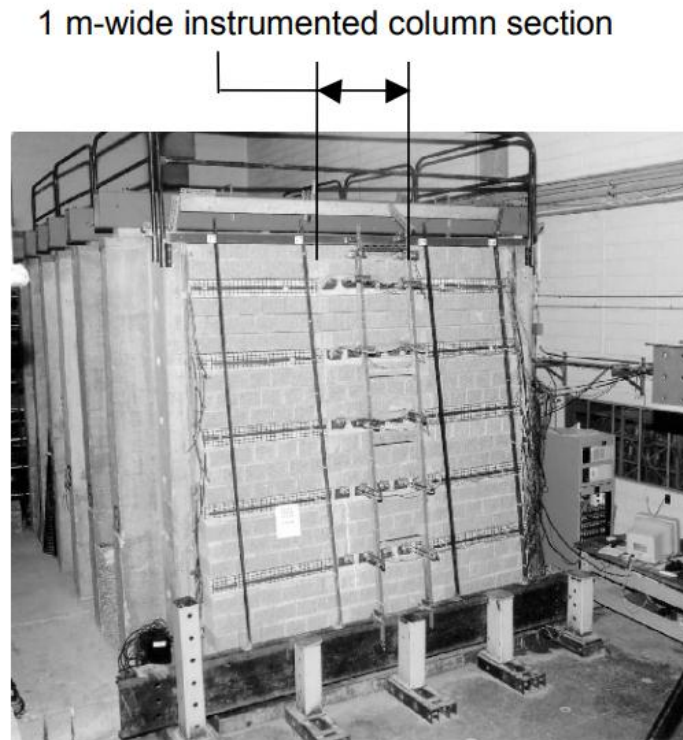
Example full-scale reinforced soil retaining wall (Hatami and Bathurst 2000).
